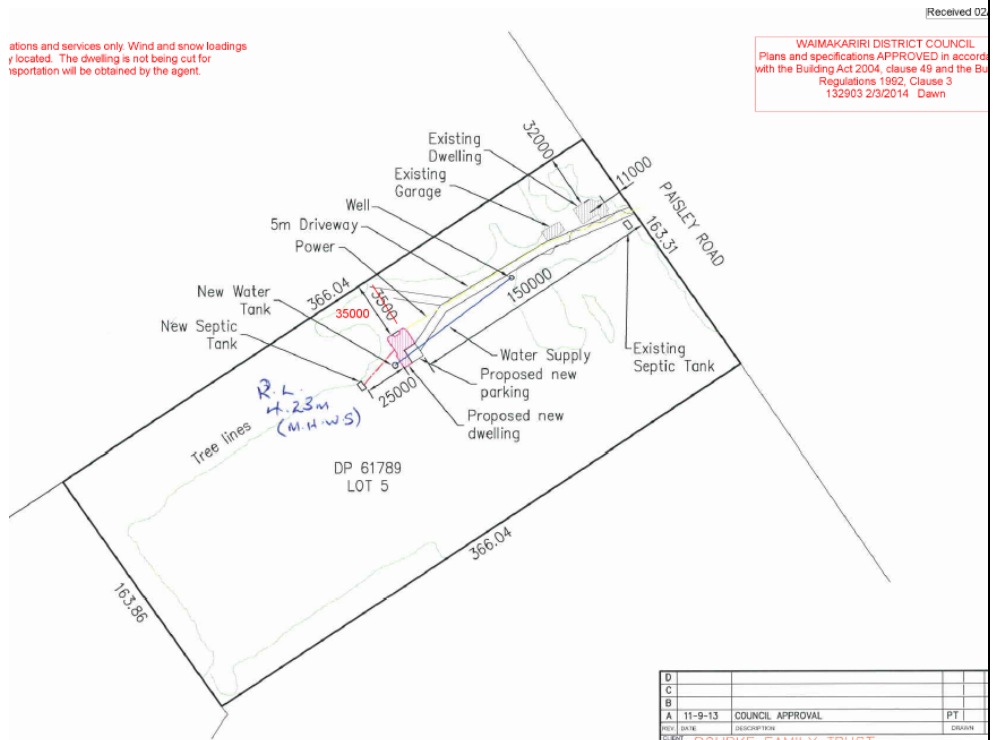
Site plan from RC135396 (TRIM 190610081668). The dwelling locations will be retained.
